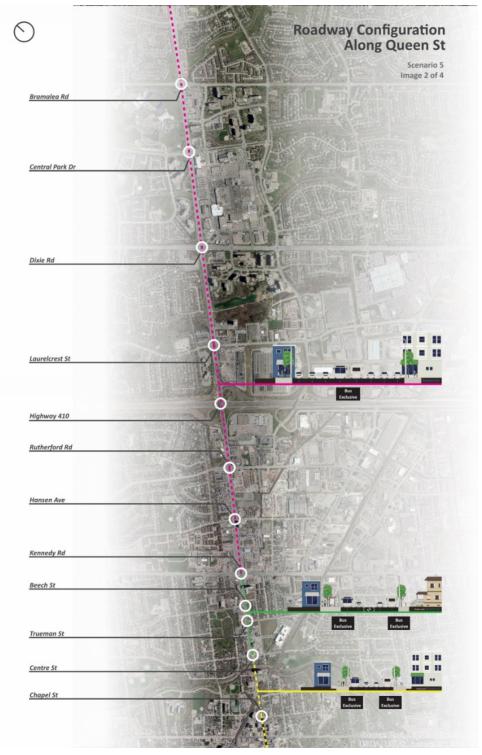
Scenario 5 road configuration, Chapel Street to Bramalea Road
